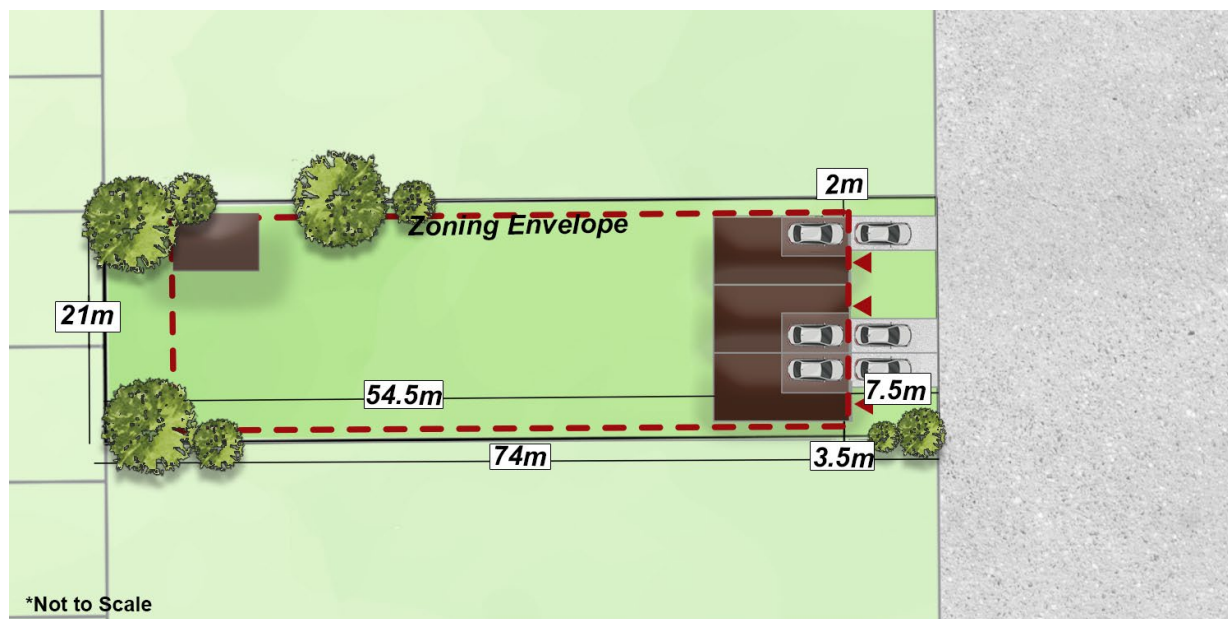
Traditional Townhouse Interior Lot with Frontage on Highway 48 Concept Plan
